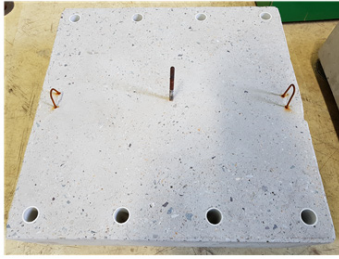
J-type anchor bolts embedded in non-cracked concrete specimens
